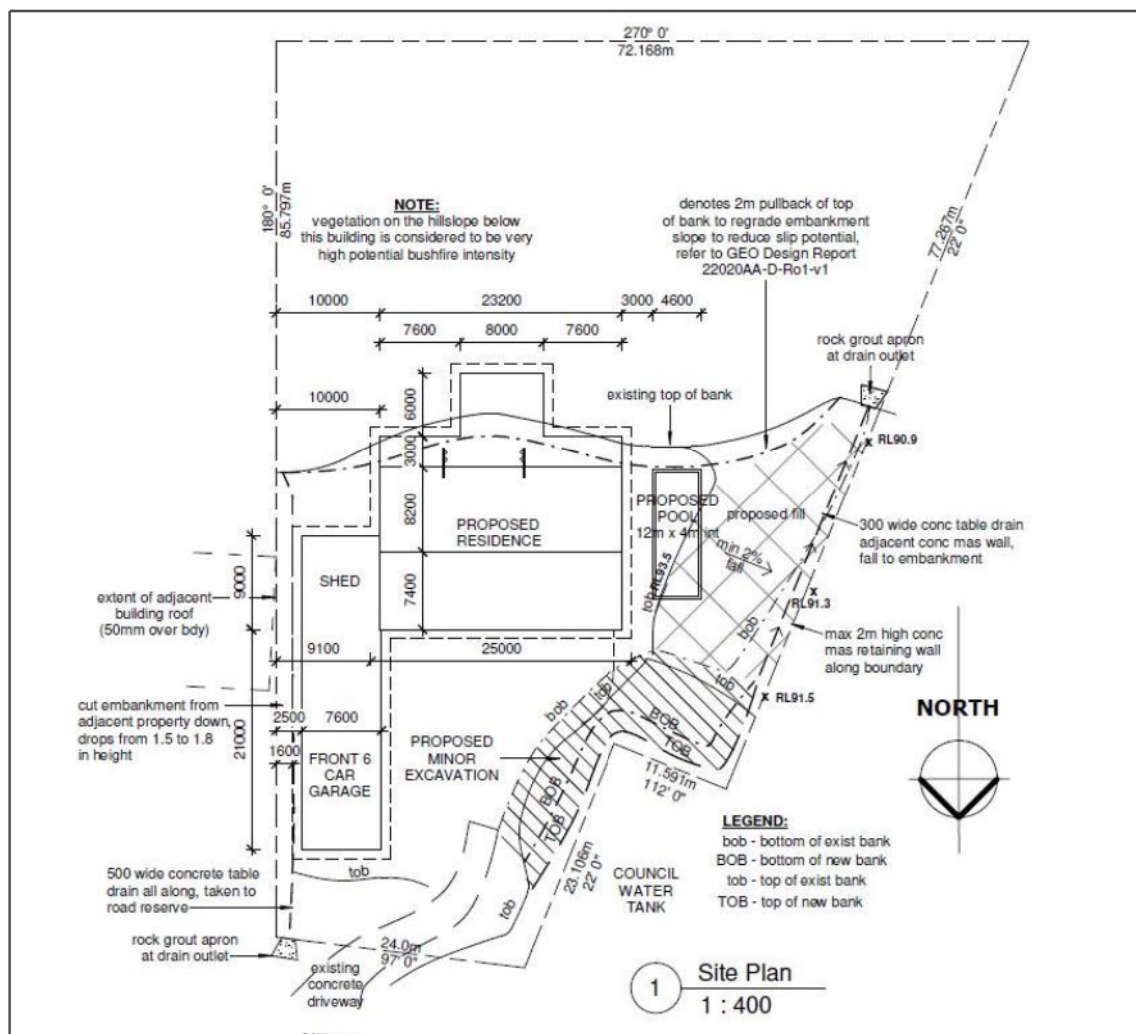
PROPOSED DEVELOPMENT (SOURCE: SITE PLAN, GREK SKYRING DESIGN AND DRAFTING, 211-21).
